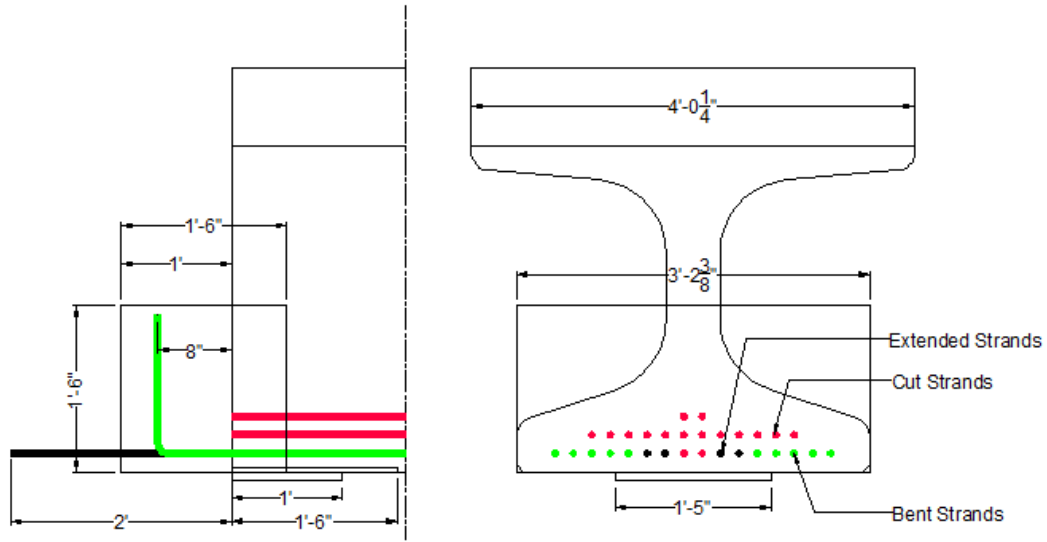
Bent, Cut, and Extended Strands at Girder Ends
